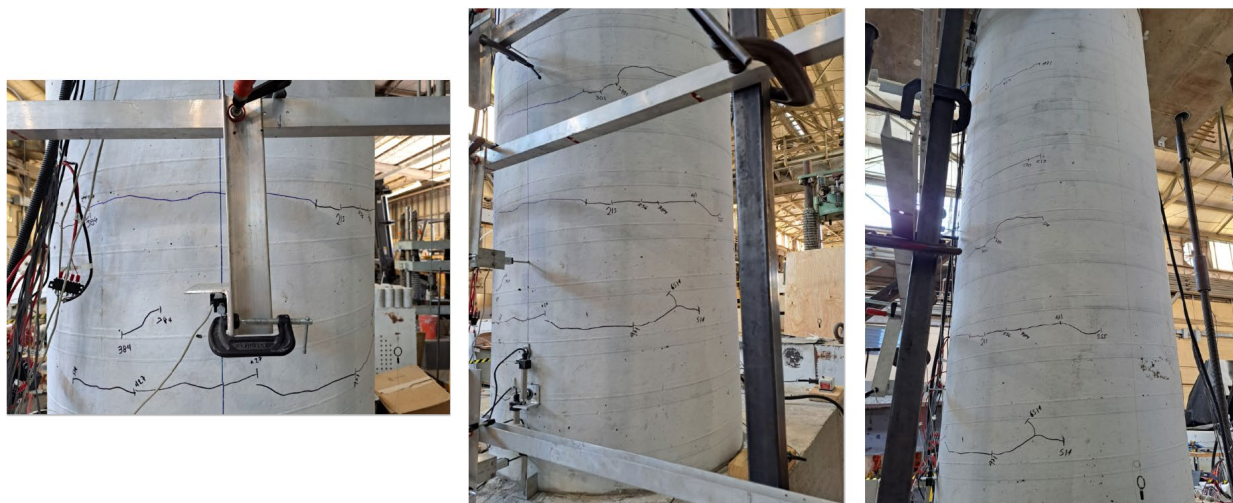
Cracks after 12-in Test for Specimen S1-CIP.
